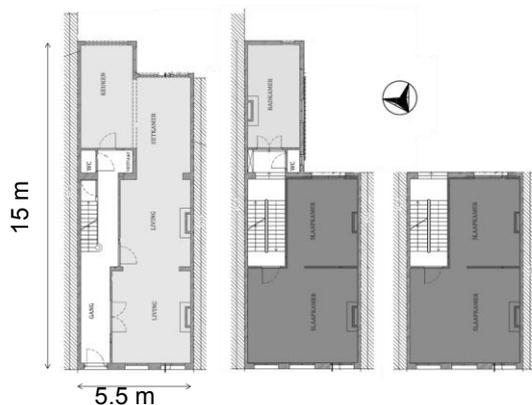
Floor plan of the three storey house with the ground floor (left), first floor (middle) and second floor (right). Light grey indicates the living zone, dark grey the sleeping zone and white the hallway. Basement floor is identical to ground floor.
